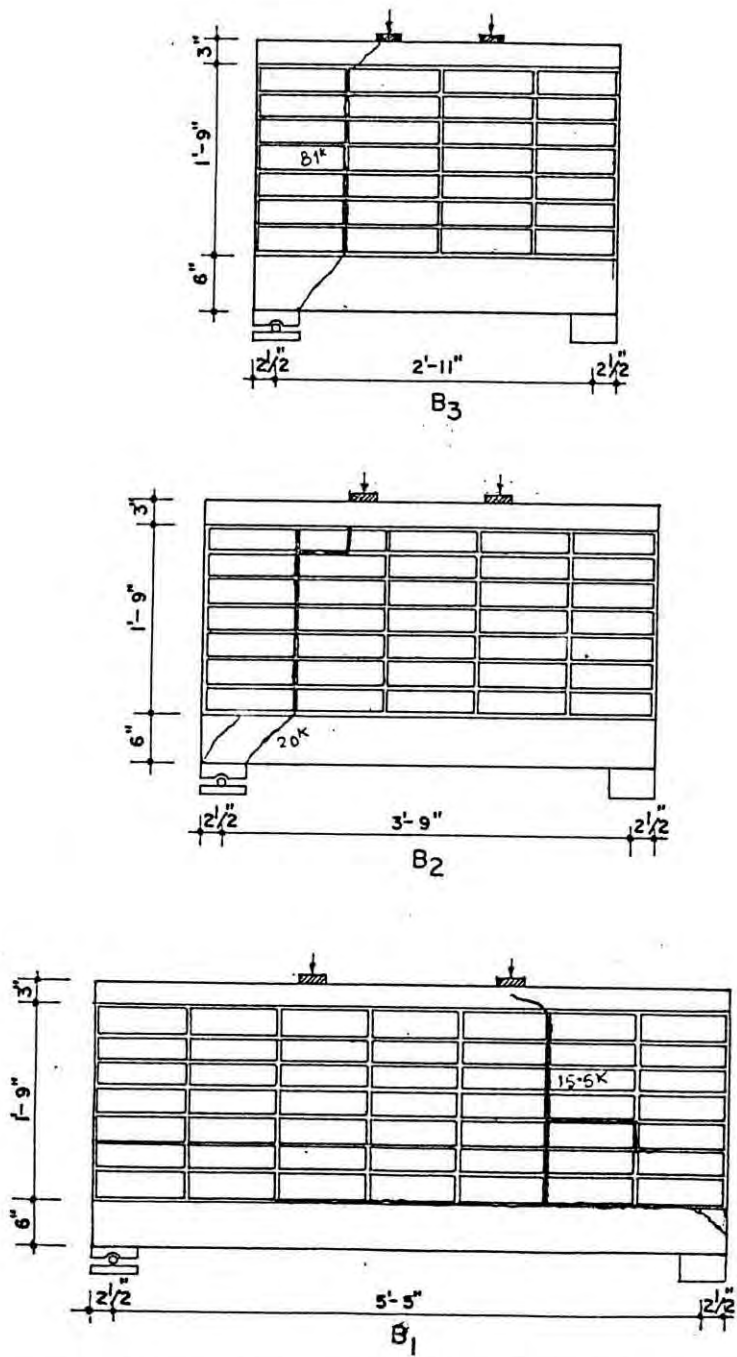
Crack Pattern of Stack Bonded Composite Wall-Beam Group B
